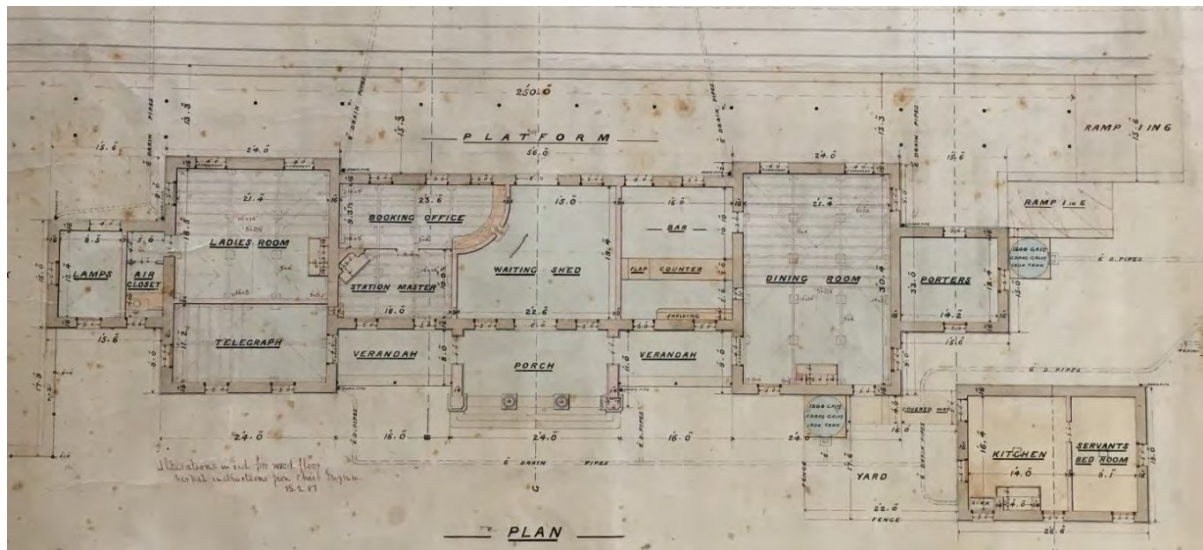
Warwick passenger station original floor plan - extract from drawing dated 25.5.1886. Source: QSA Series 17692 Plans of Queensland Railway Station Buildings etc., Item ID 120966.
